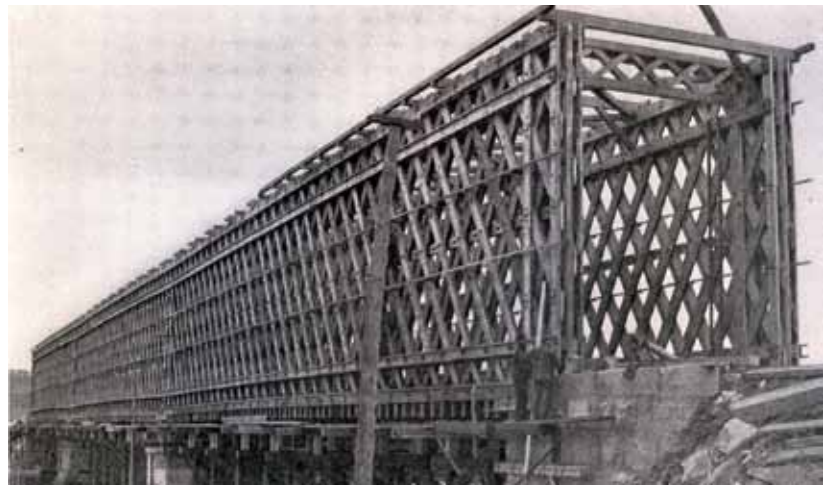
Timber Town Truss under construction. Boston and Maine Railroad. (Merriman & Jacoby, *Roofs and Bridges*.)
